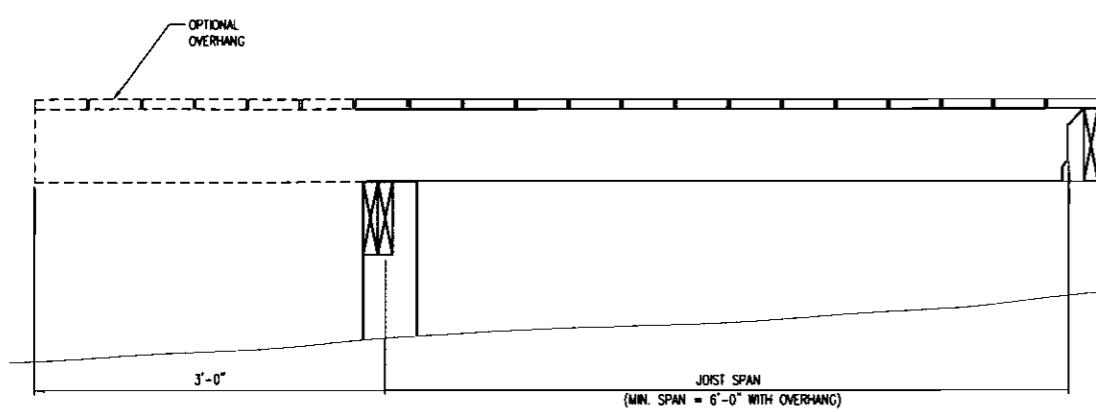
JOIST SPAN - DECK ATTACHED AT HOUSE
